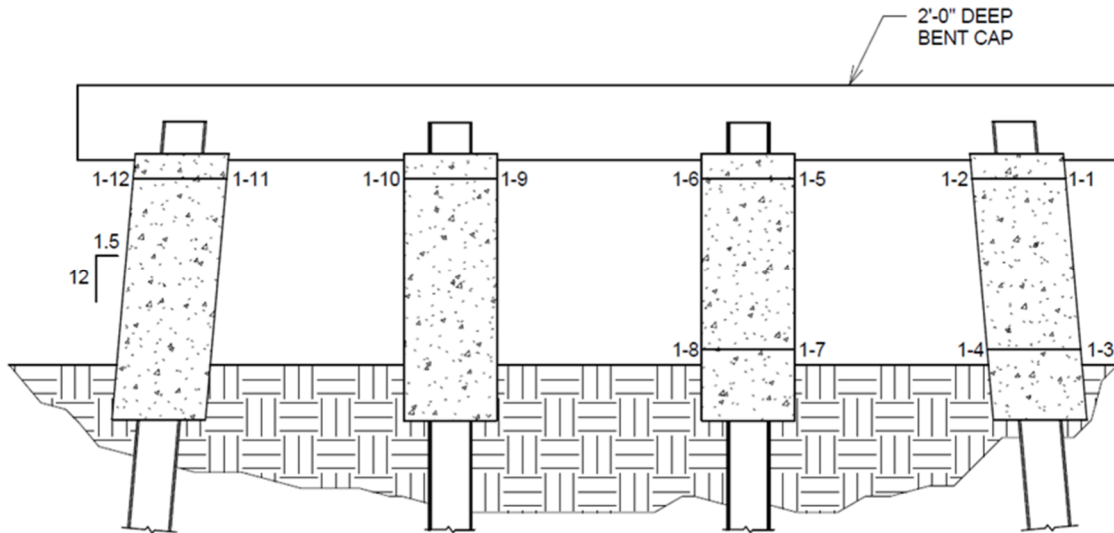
Instrumented Cross-sections on the Concrete Encasements (Courtesy of Campbell 2015)
